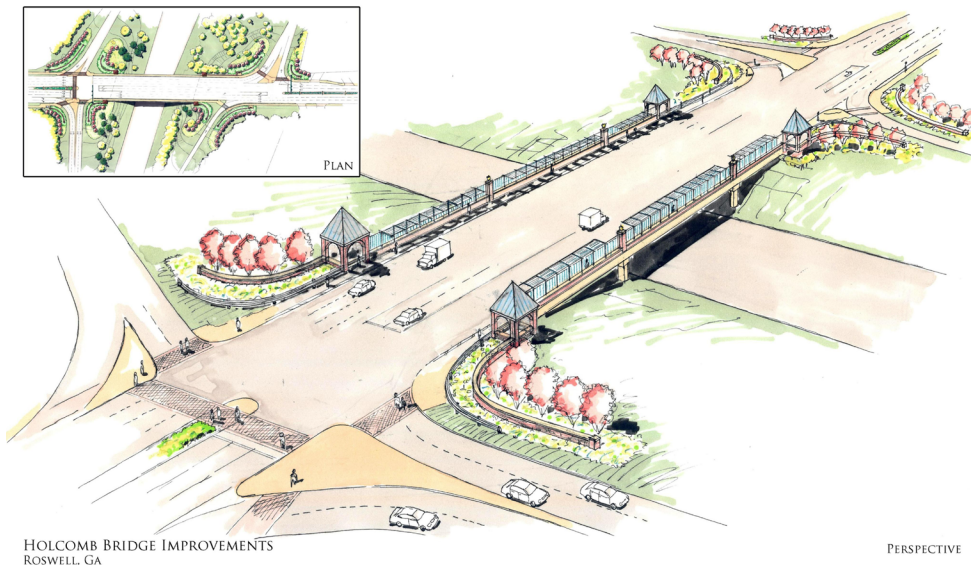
Rendering of the proposed gateway treatment at Holcomb Bridge Road and GA 400, developed by Arcadis as part of the Holcomb Bridge Road at 400 Corridor Study.
